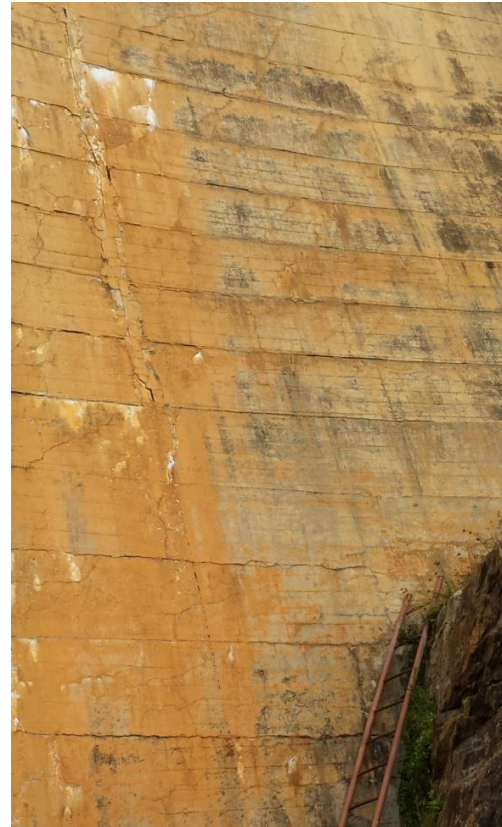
Poortjieskloof Dam: Close-up view of the cracking patterns on left flank downstream face
